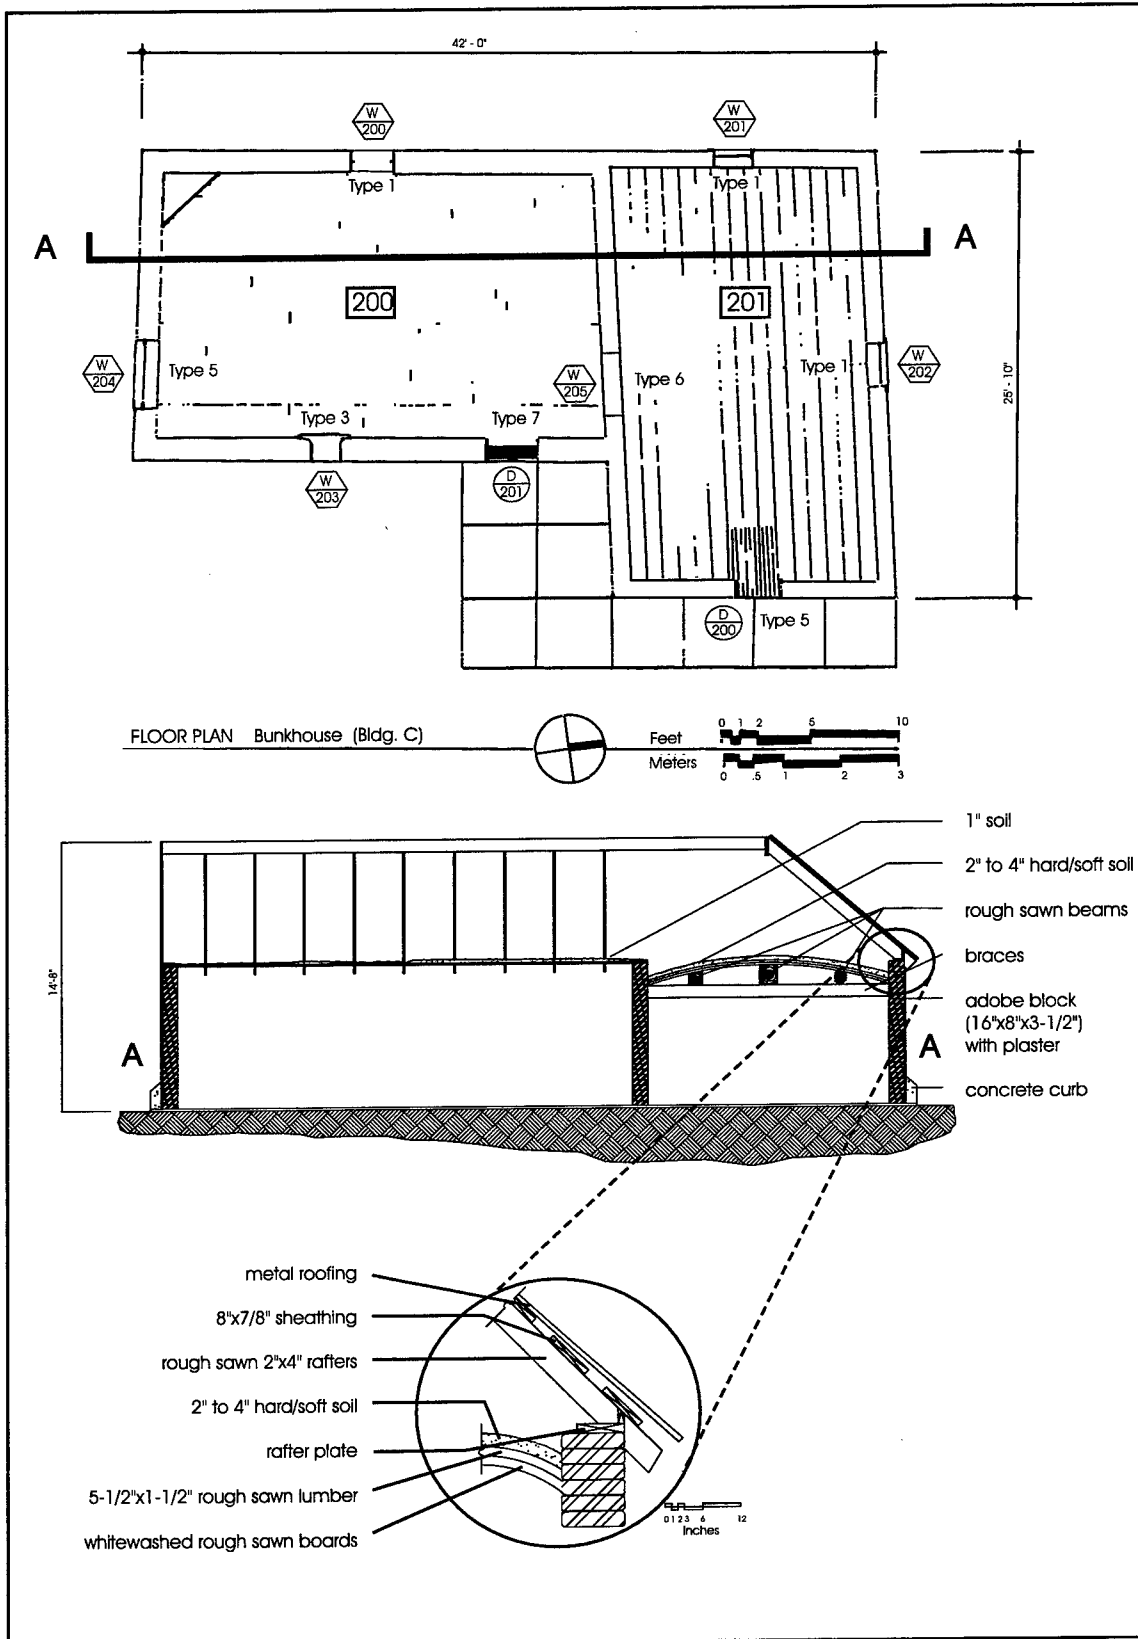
Structure C (Bunkhouse) floor plan and roof structure. Illustration based on a measured drawing by A. Narvaez for the Rocky Mountain Regional Office.
